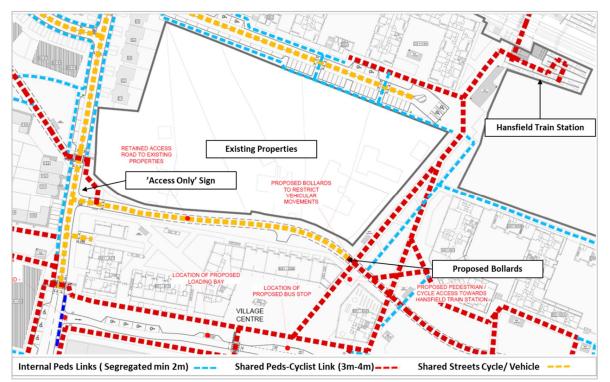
Proposed Access Arrangements to Existing Properties in the Site
